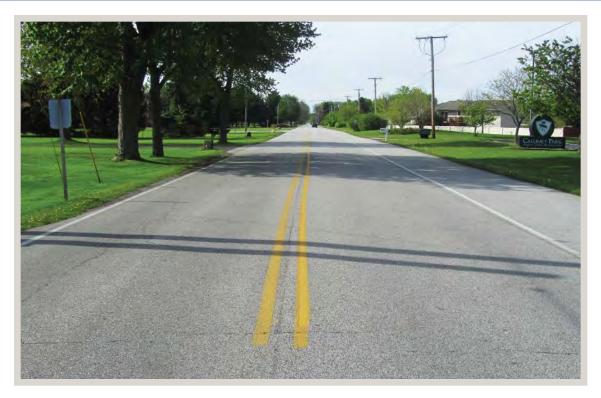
Looking south along County Line Road from the Calumet Park Funeral Chapel
